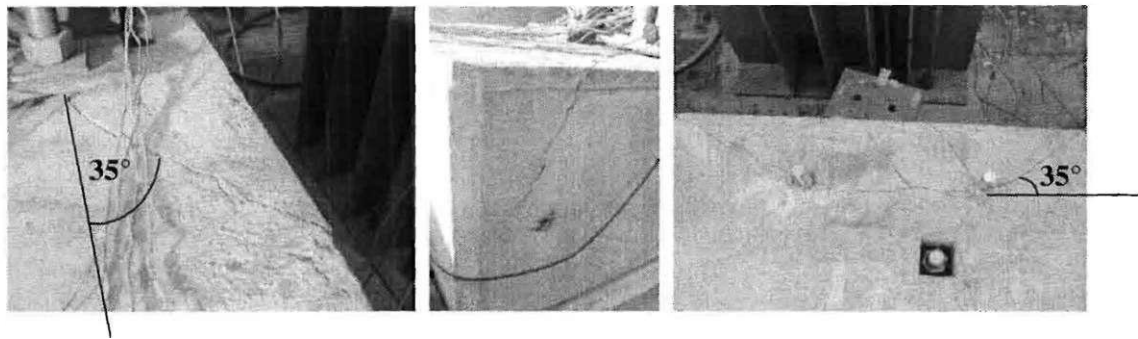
Failure surface with diagonal crack of 35° revealing concrete breakout strength
